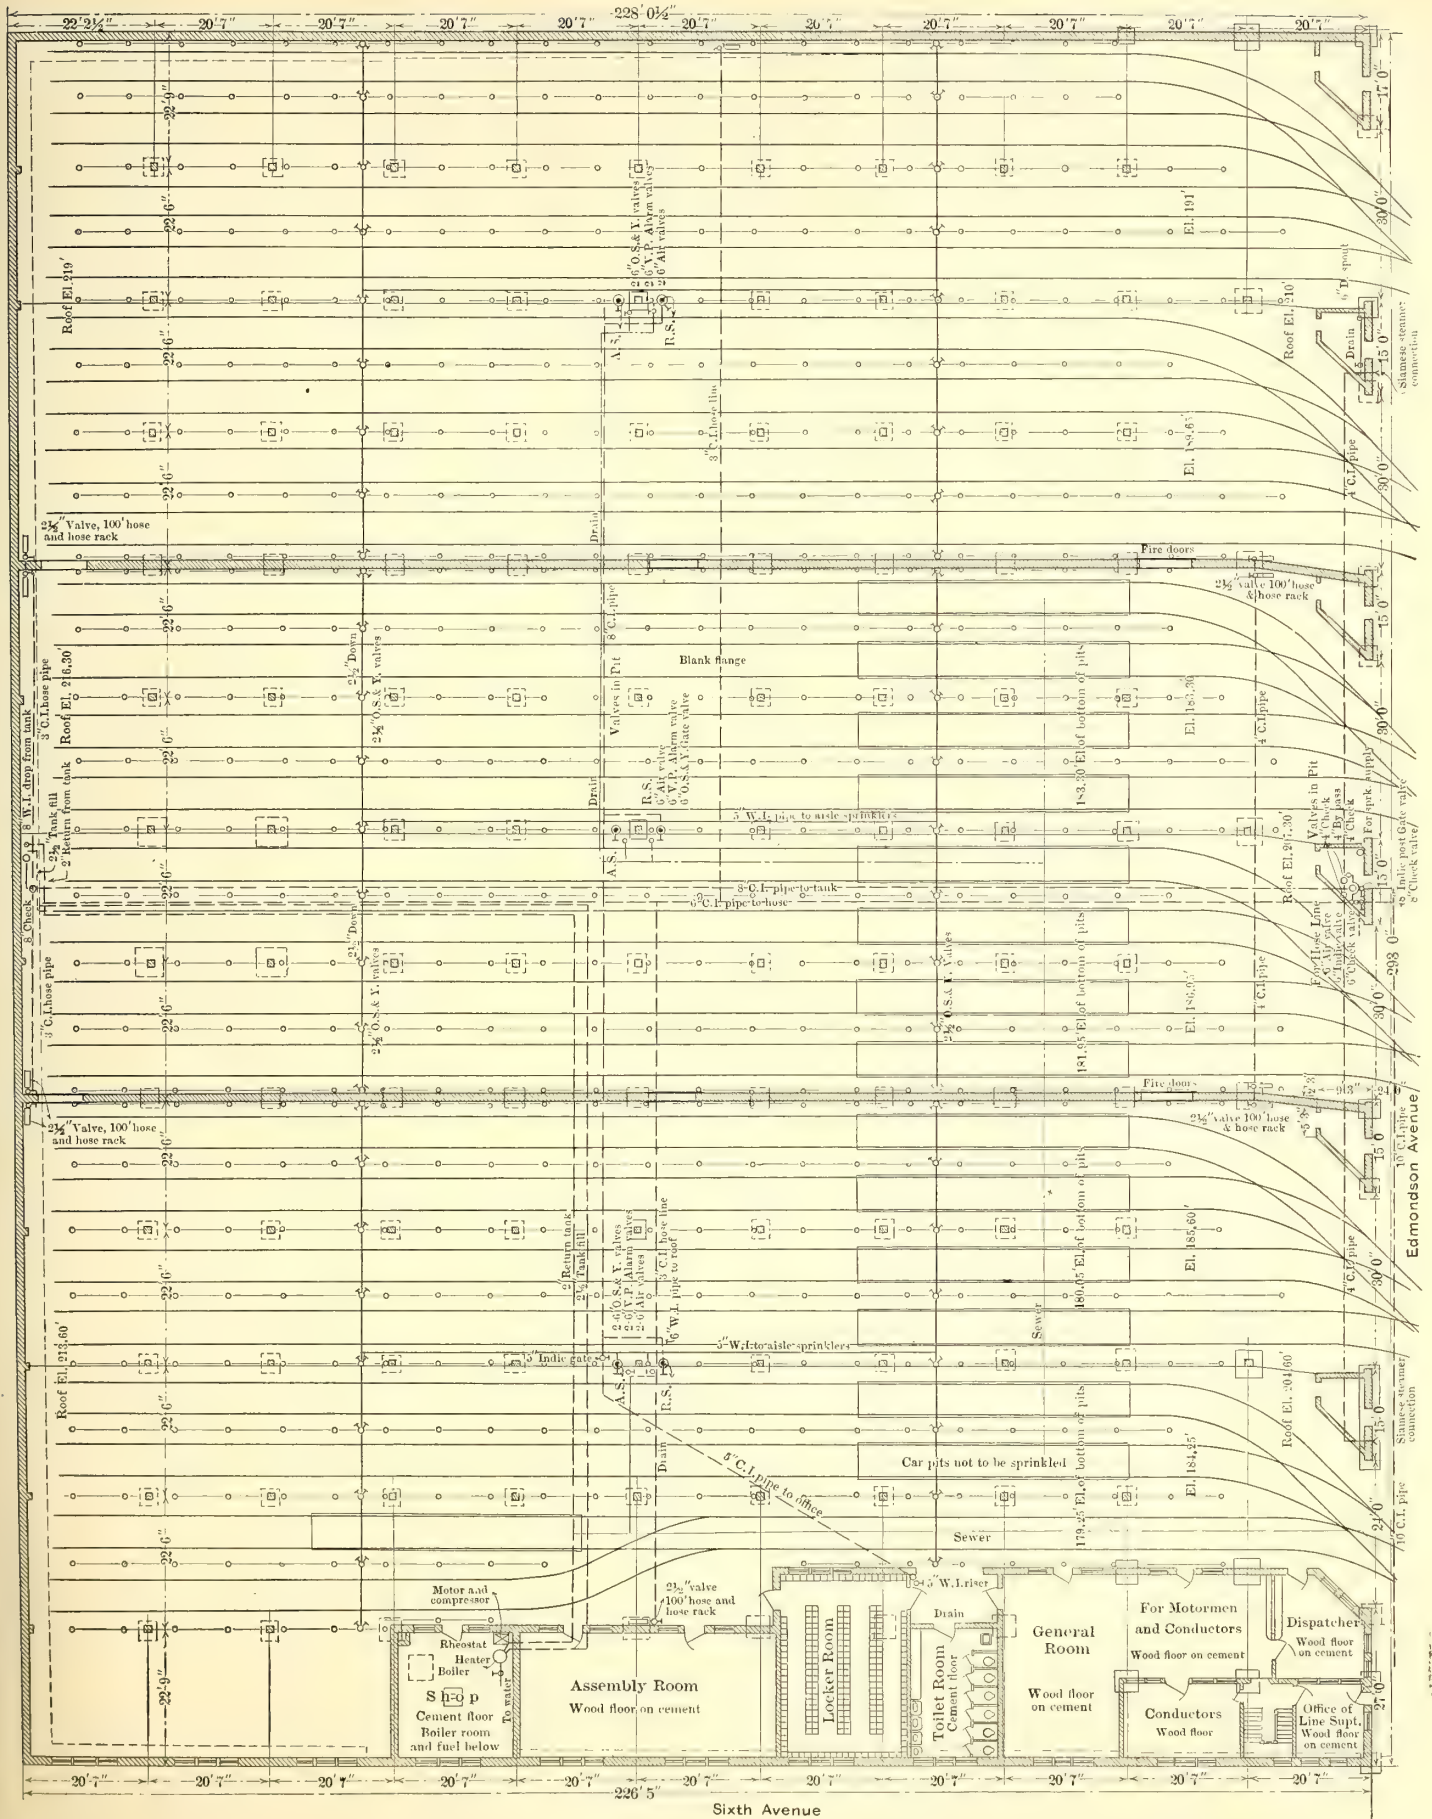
GENERAL PLAN OF EDMONDSON AVENUE CAR HOUSE, SHOWING AISLE SPRINKLERS
